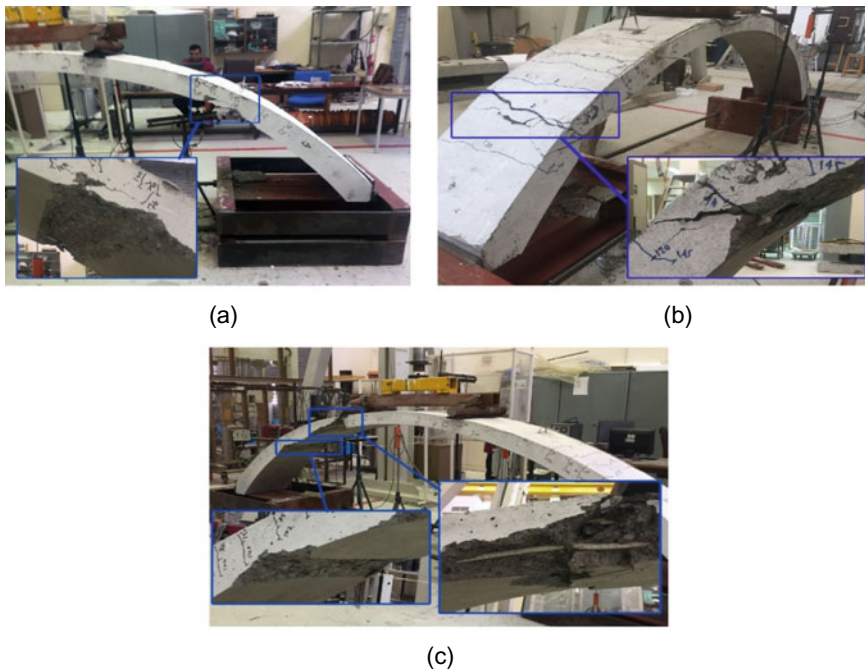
Failure of test specimens: a G2; b G3; and (G4)
